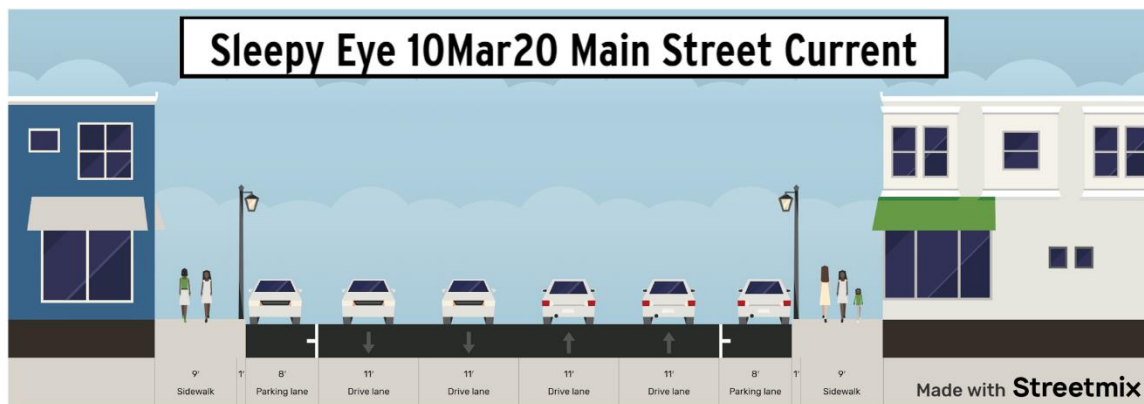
Sleepy Eye Site: Existing Dimension - Roadway, Sidewalk
